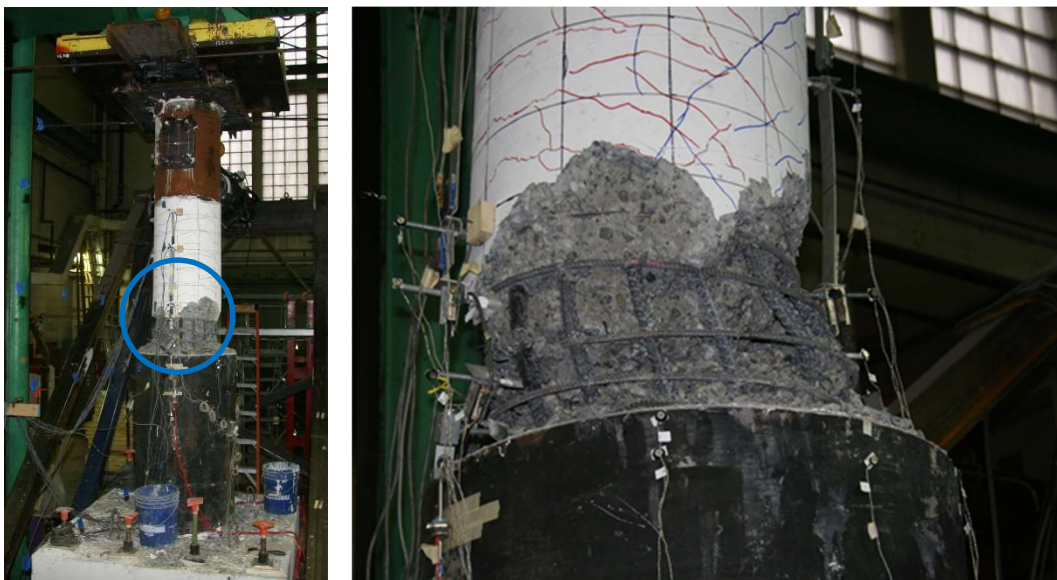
Specimen 30-21: Failed Specimen 30-21 at 8% Drift
